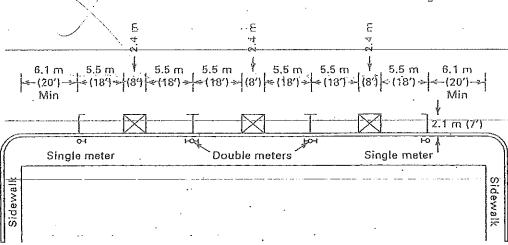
Paired curb parking layout. (Courtesy Transportation Research Board.)
